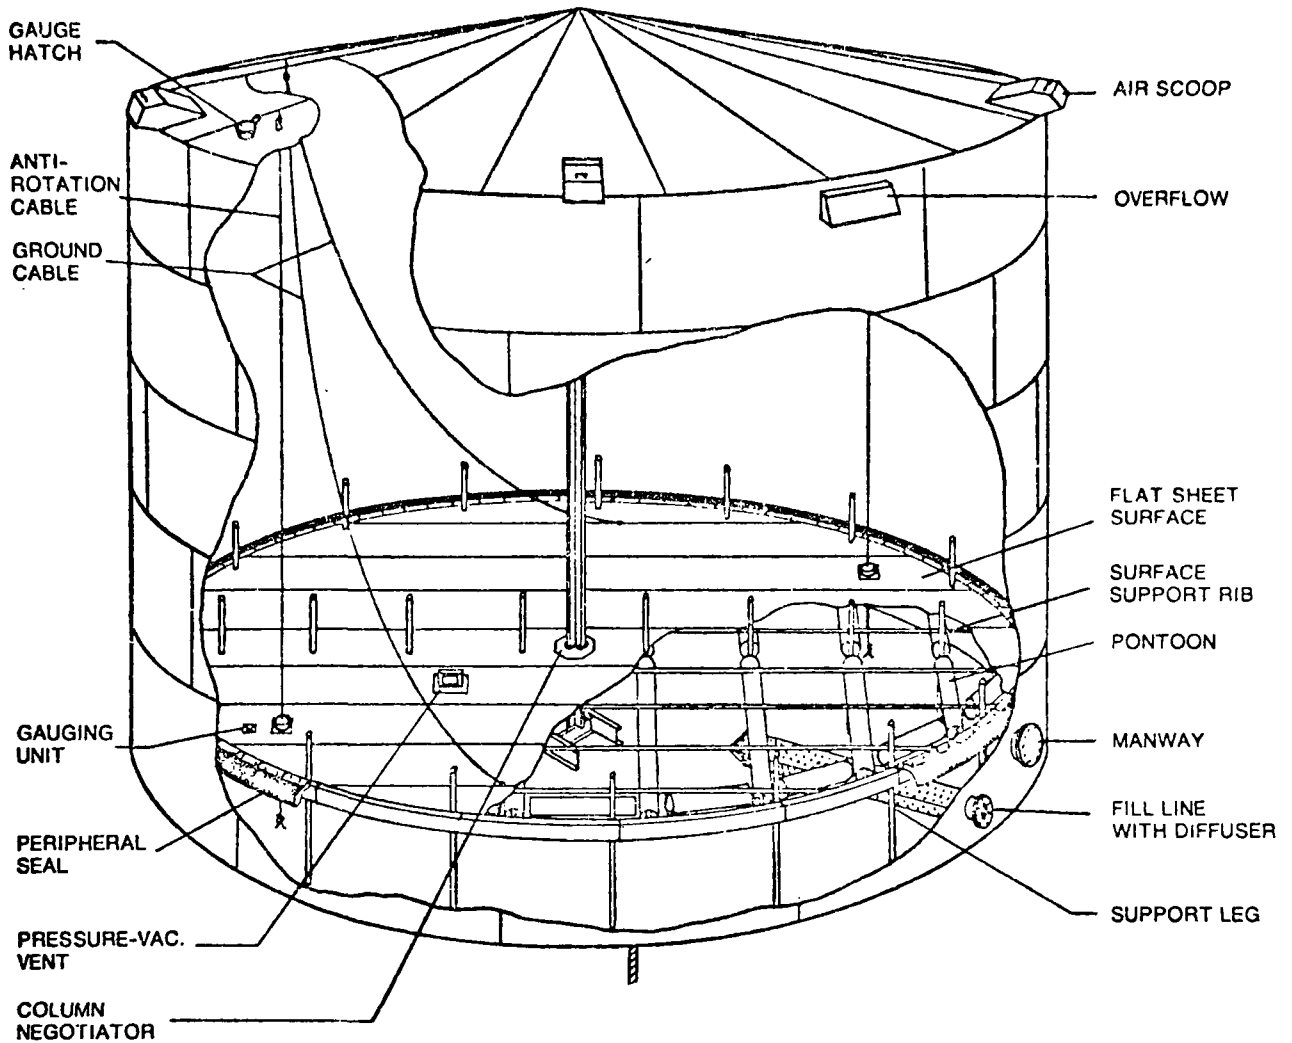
SCHEMATIC VIEW OF TYPICAL FLOATING DECK
